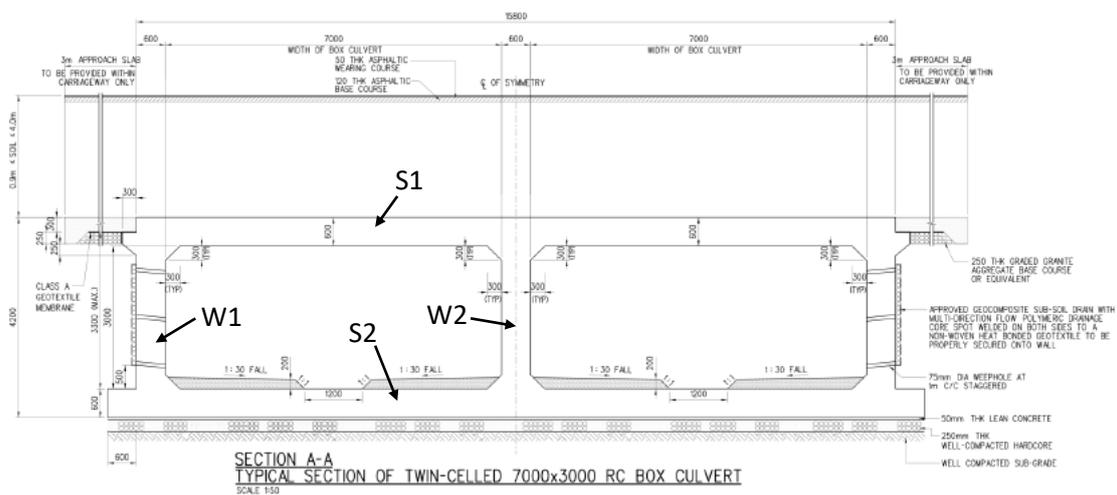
Typical section of twin-celled 7000 mm x 3000 mm RC box culvert
